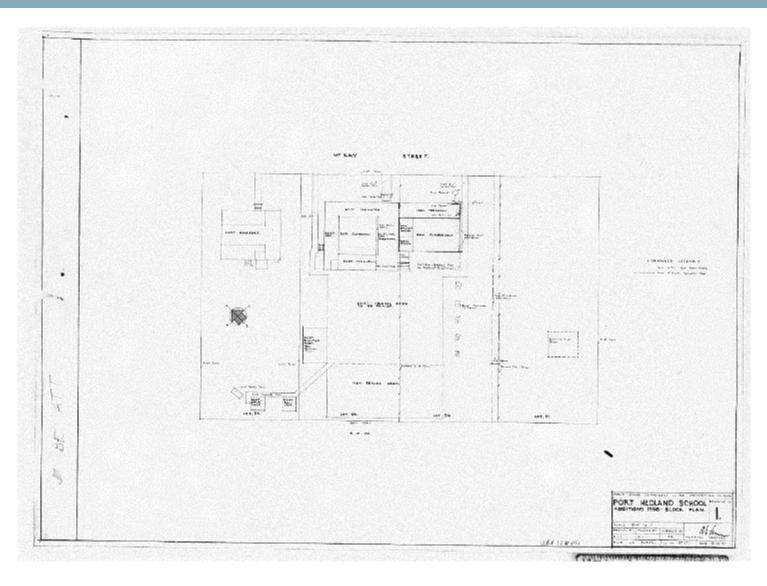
Block Plan showing addition of one new classroom, 1958 Courtesy SROWA Cons 1647 item 12404.
